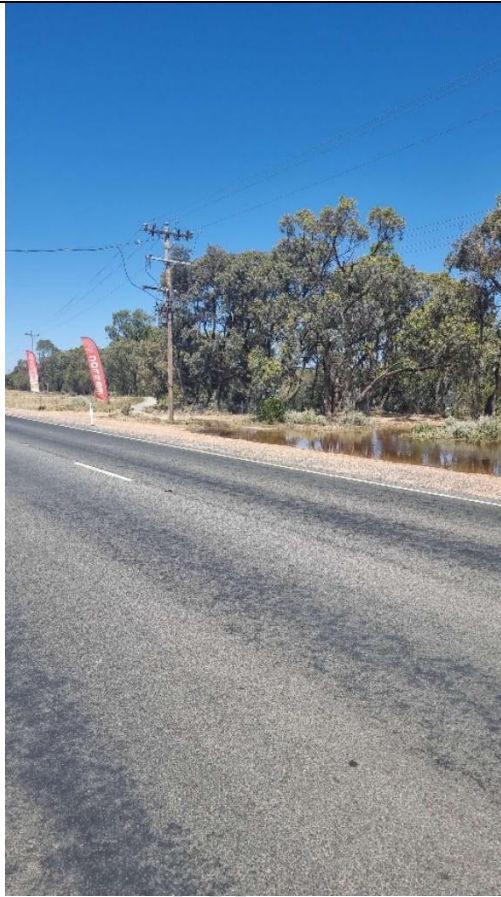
Looking east along Silver City Highway near its intersection with Manly Road [*Photo taken on 15/12/2022 at 15:28 hours*]
